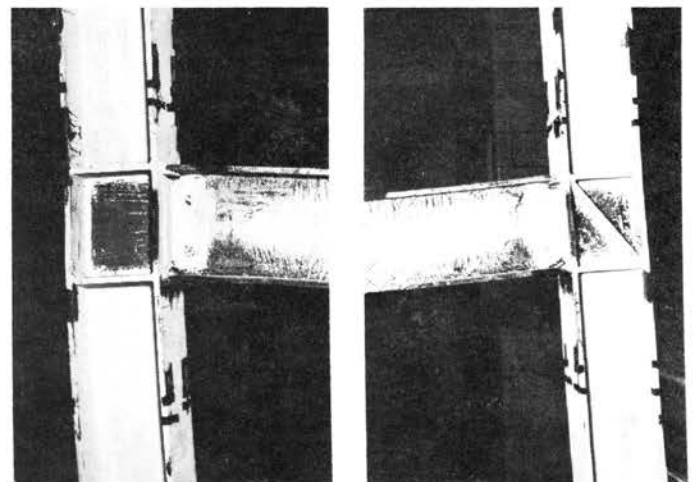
Beam-to-column connections of Frame A after testing
